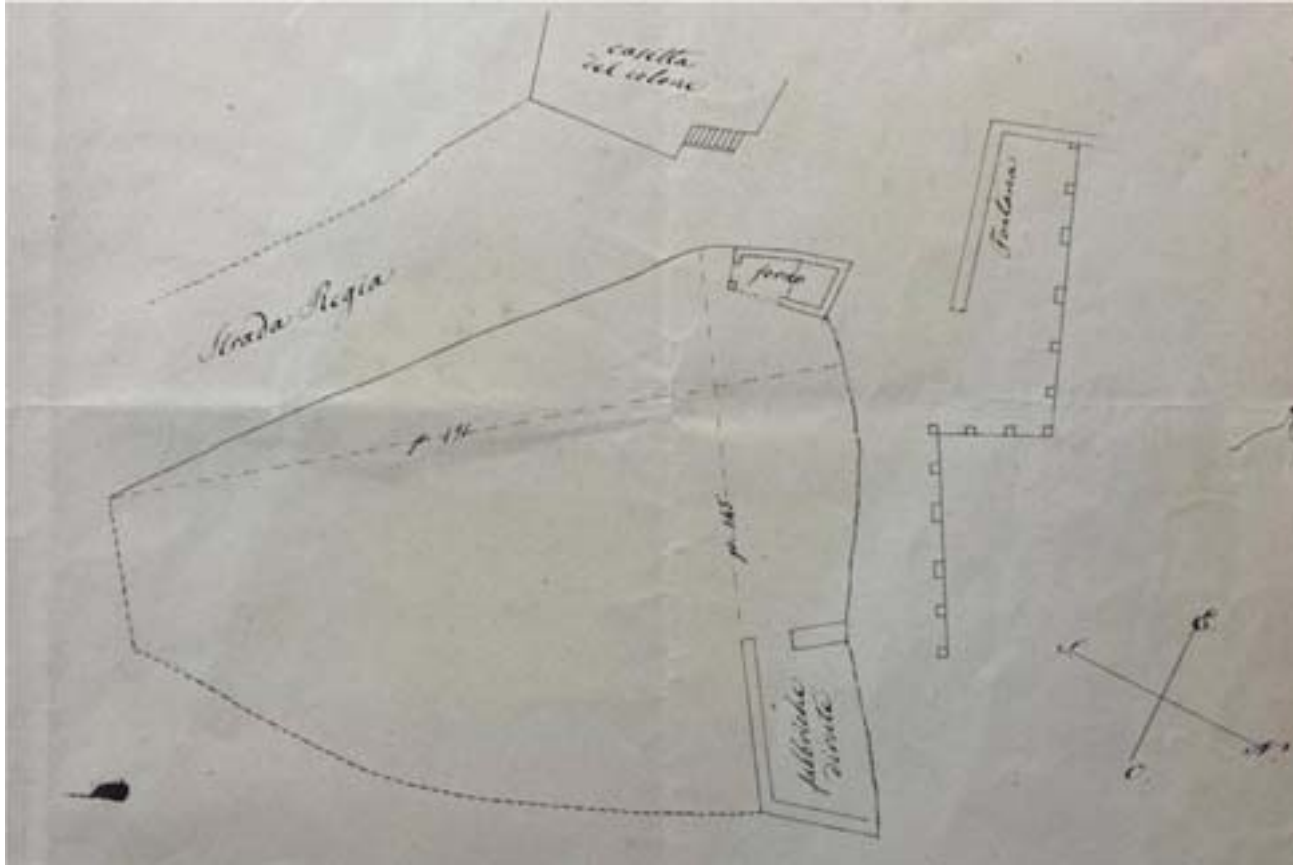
Plan of the Fondo Paradiso (A.S.Cs)
